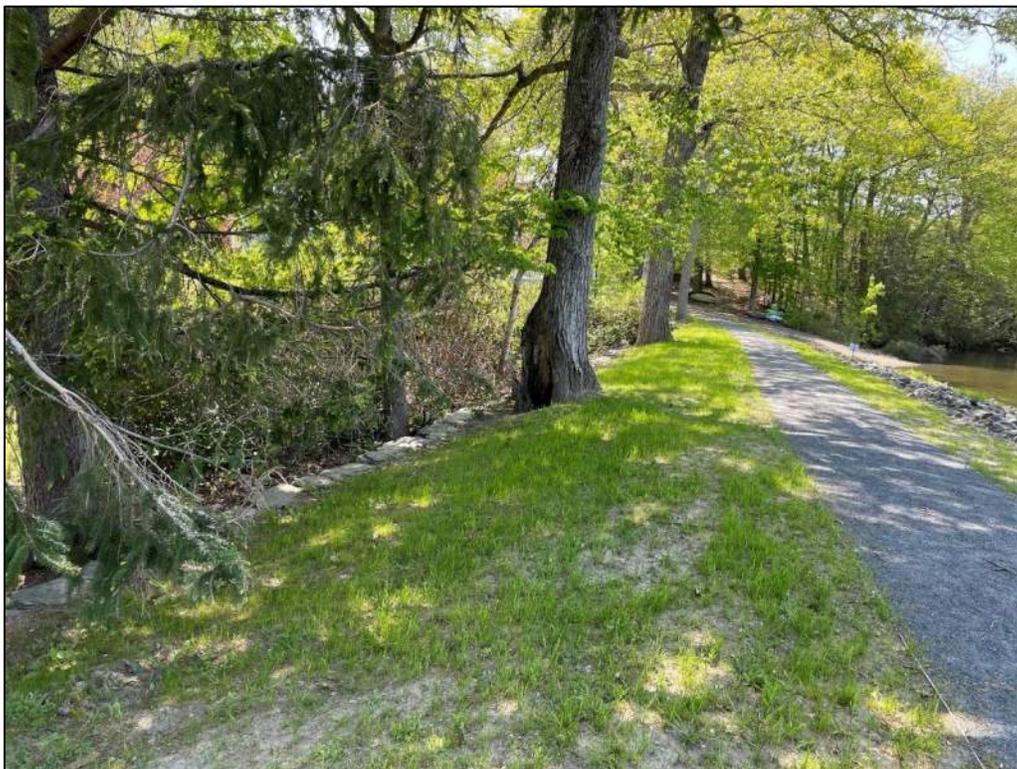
Dam crest near right abutment; note large trees growing on embankment
